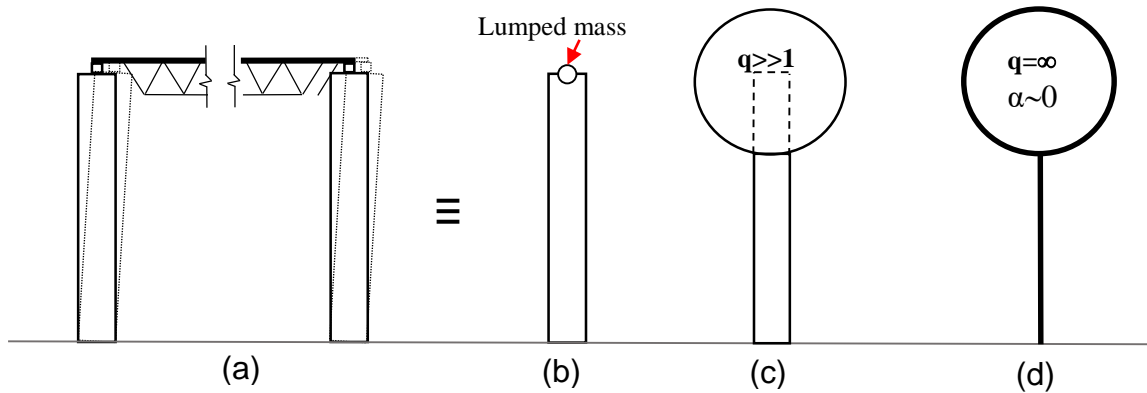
Slender URM rocking frame: (a) Concrete block unreinforced masonry with rigid diaphragm on top connected at the centers of the piers (b) Single pier with lumped mass (c) Pier with very large mass (d) Pier with zero slenderness and infinite top mass
